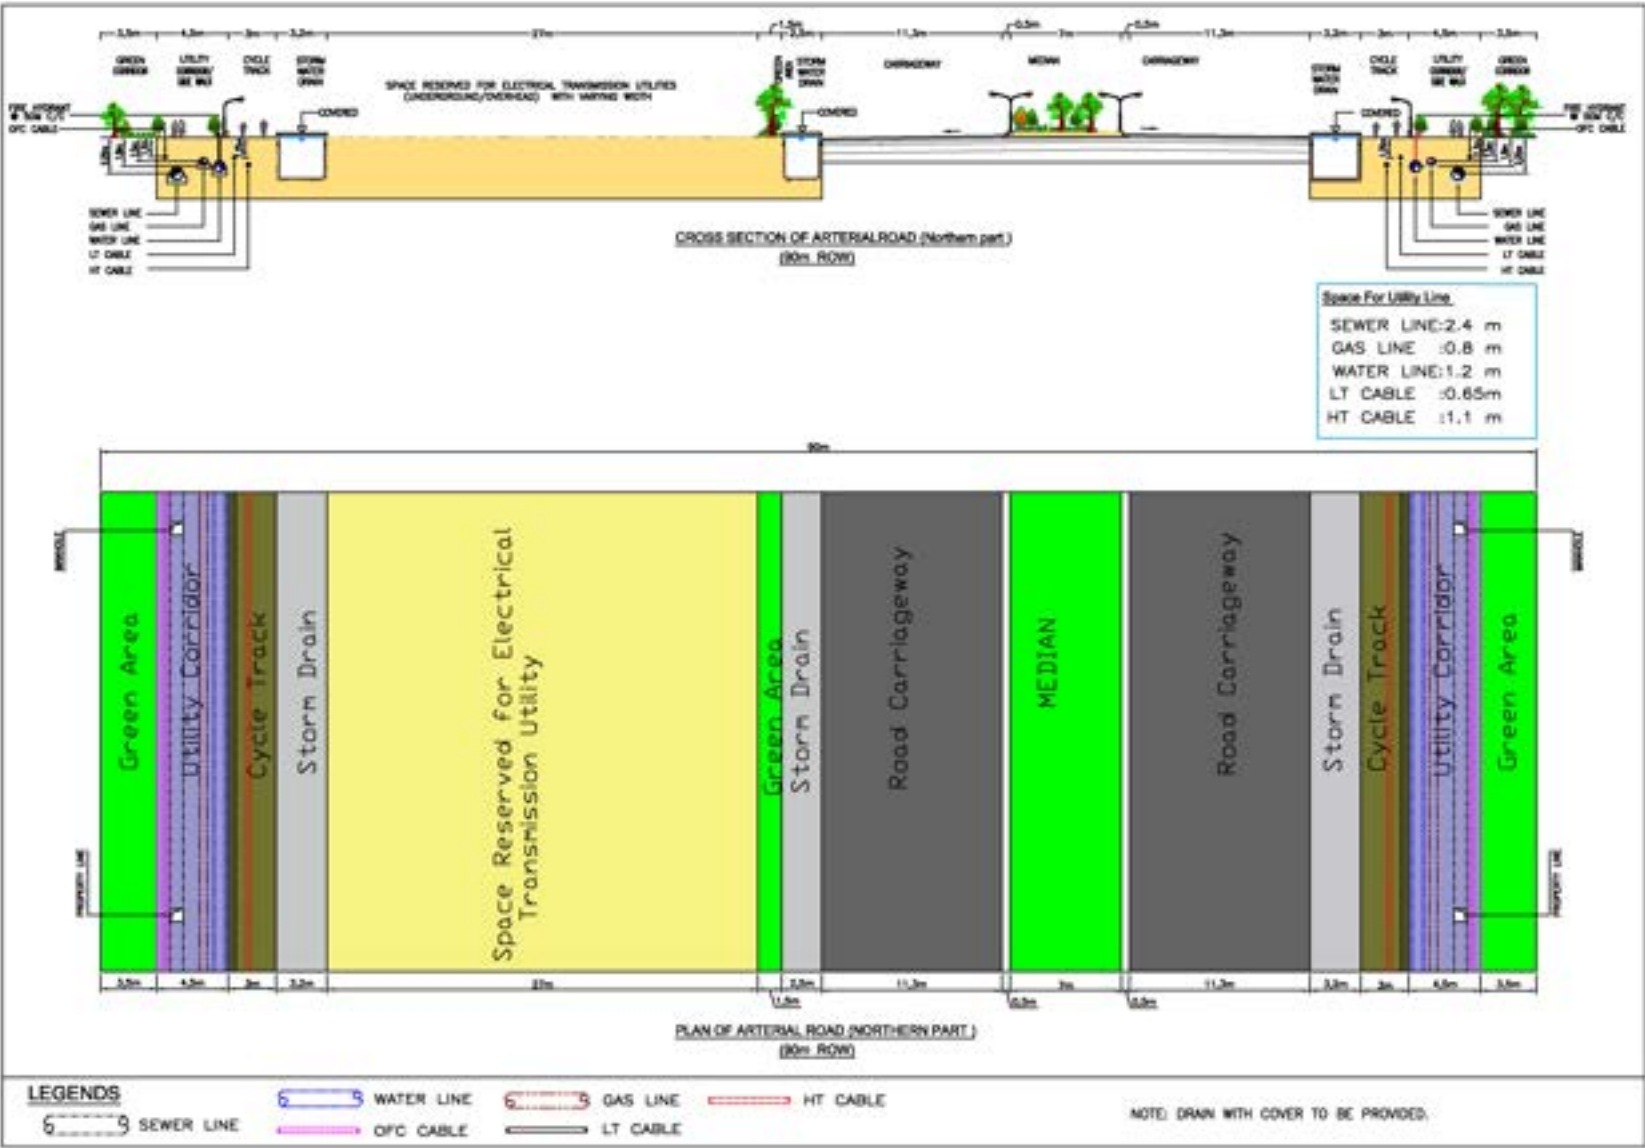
Cross Section and Plan of 90m ROW Arterial Road (Northern Part)
